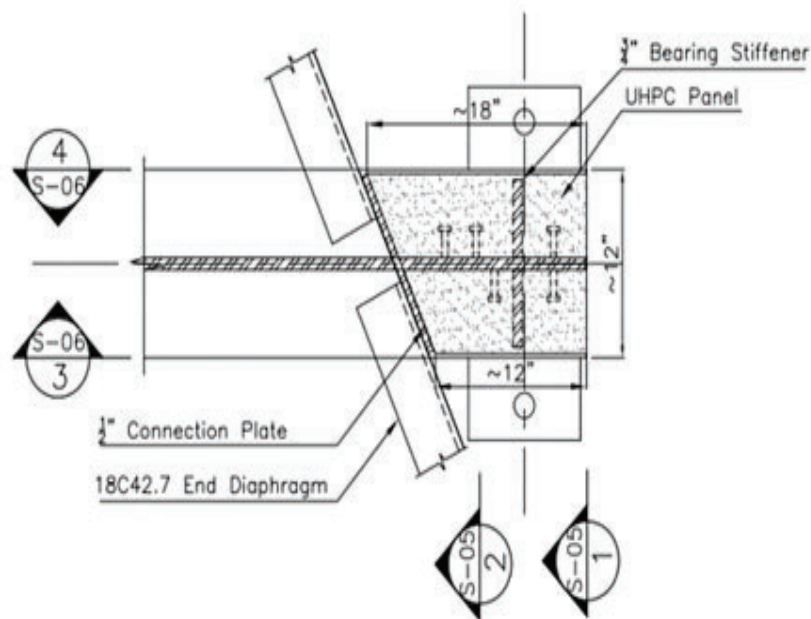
Sample plan view of UHPC repair with concrete placed (Zaghi et al., 2017)
